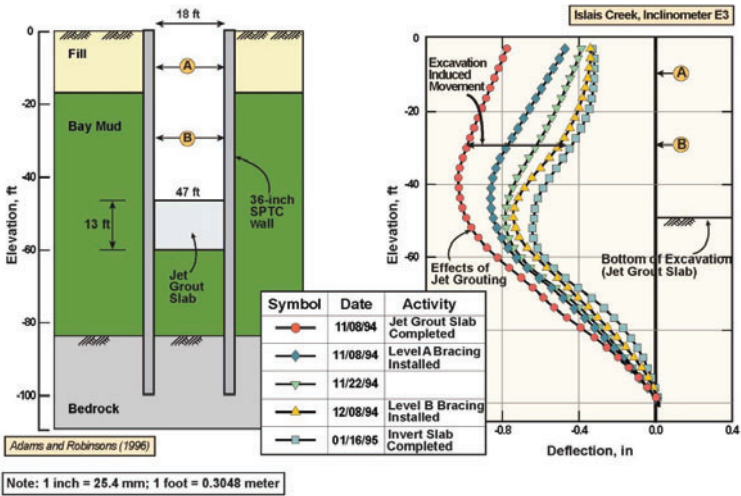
Lateral Deformations Caused by Jet Grouting and by Excavation: Islais Creek Contract E
